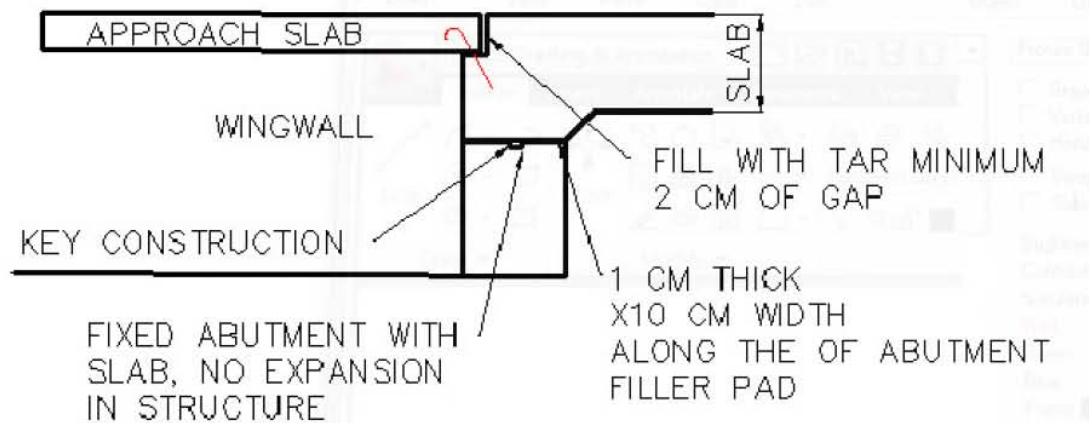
Fixed Abutment no expansion joint on the bridge.
